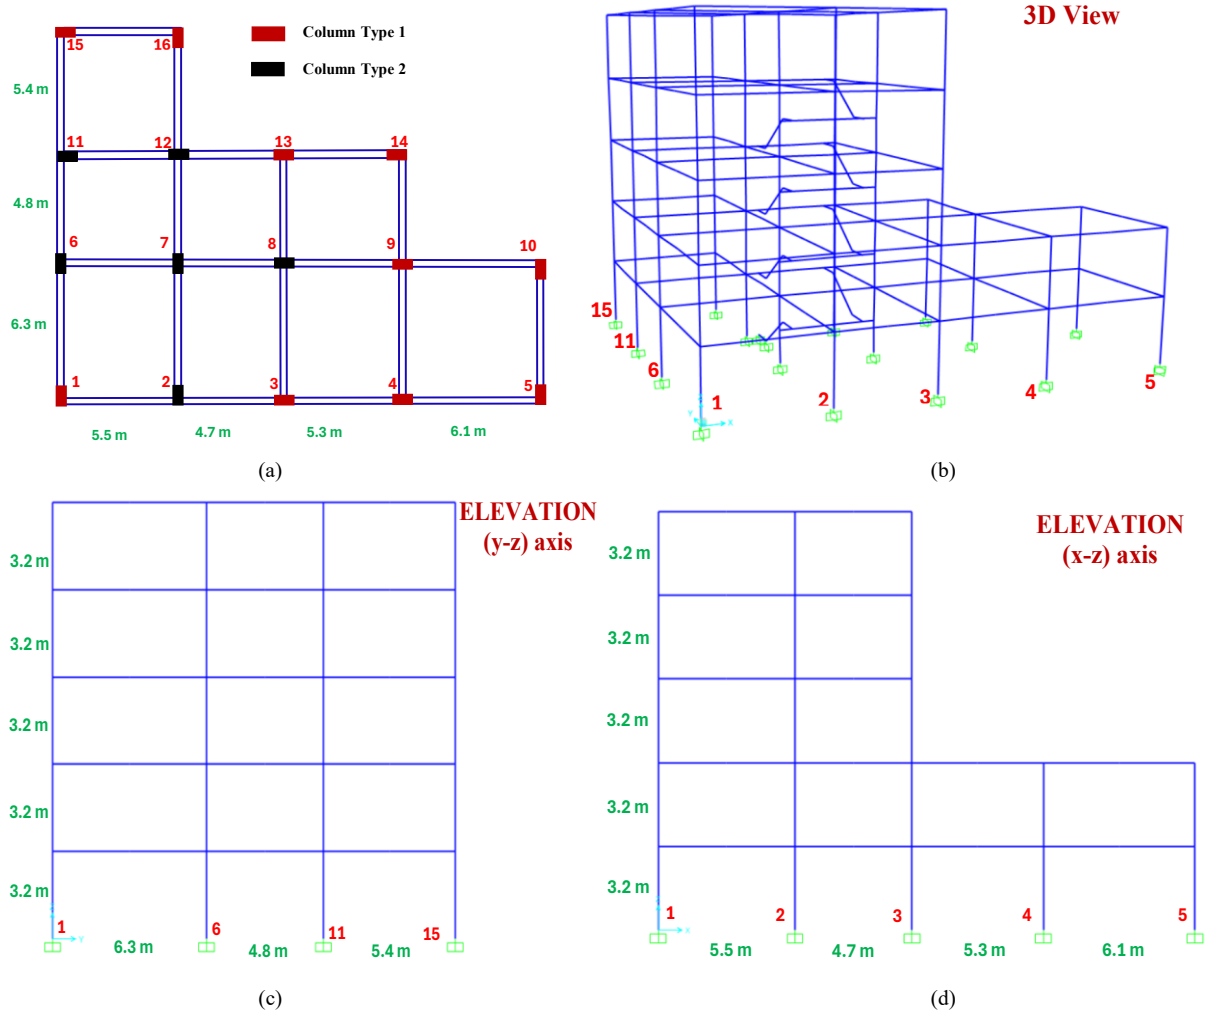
Geometrical details of structure (a) plan; (b) 3-D view; (c) elevation (y-z) axis; (d) elevation (x-z) axis
